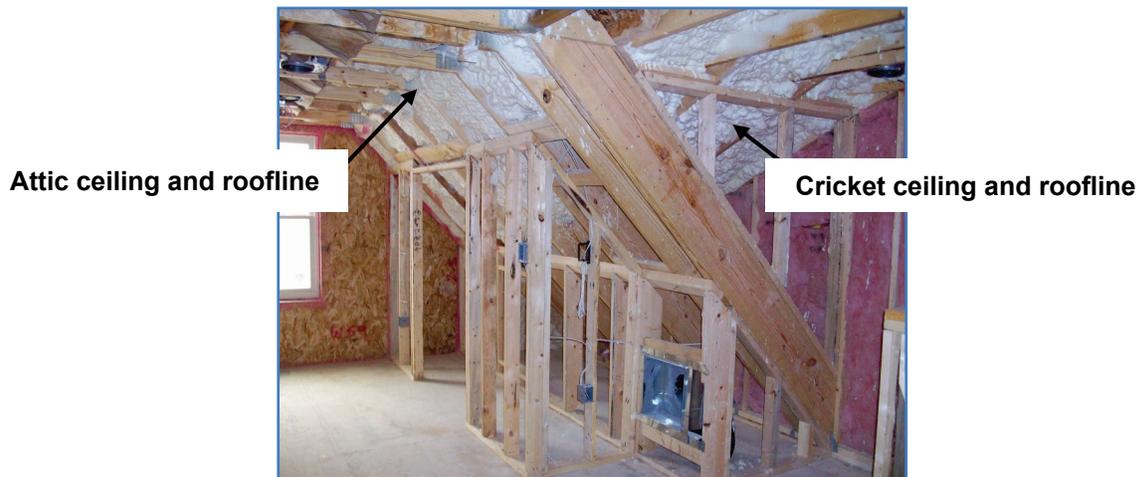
Attic roof at cricket fully sealed and insulated with spray foam
